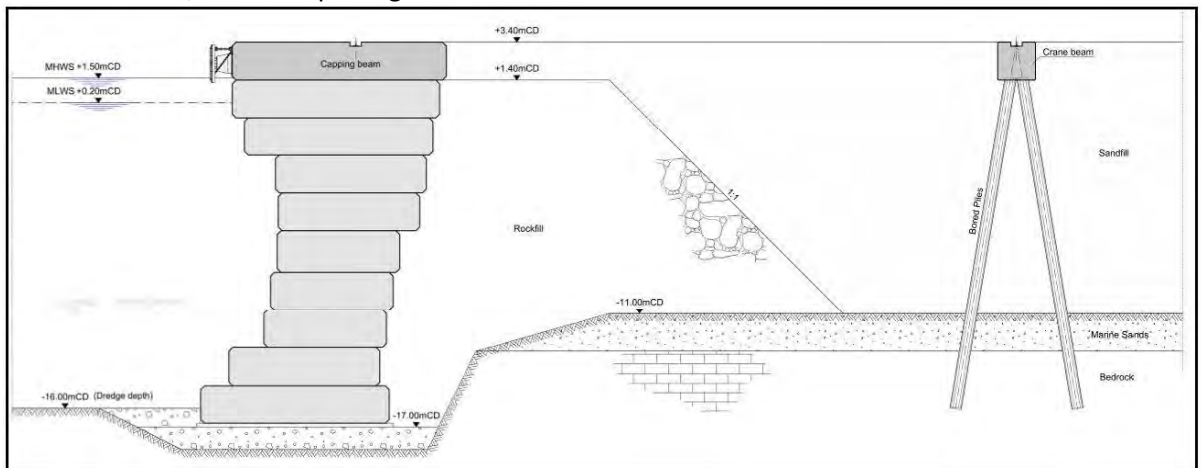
Typical Block Wall Cross Section (Source: Sellhorn!HPC, 06/2014)
